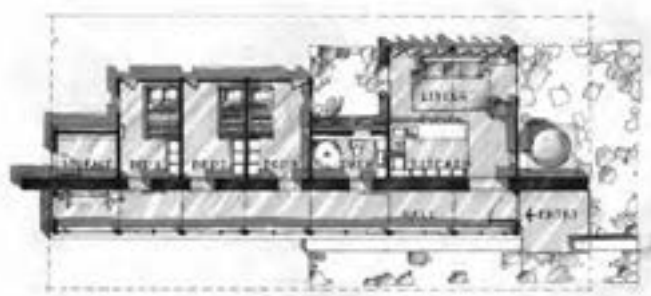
Floor Plan, Rosie Joe House, Navajo Nation, Utah, 2004.
